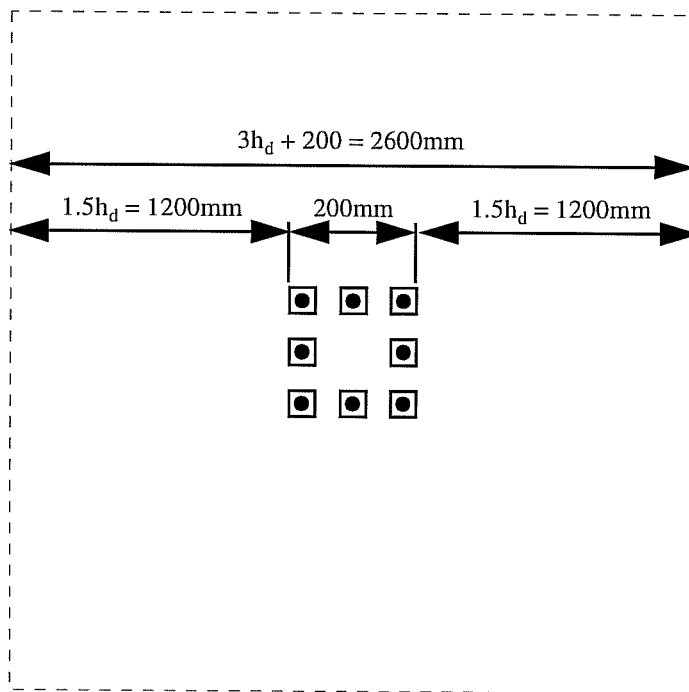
Pullout-Cone Failure Area for Column-Footing Design Example
